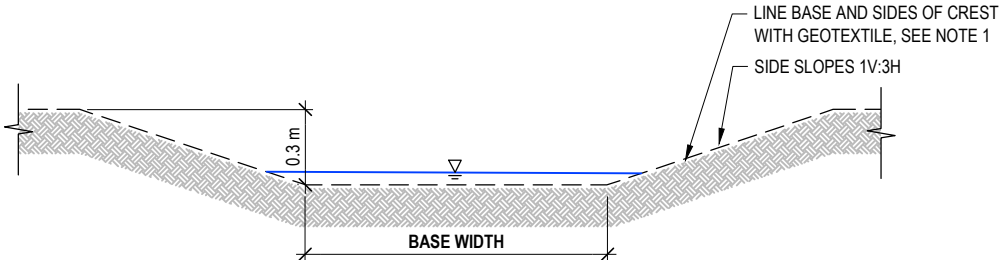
CROSS-SECTION OF EMERGENCY SPILLWAY
